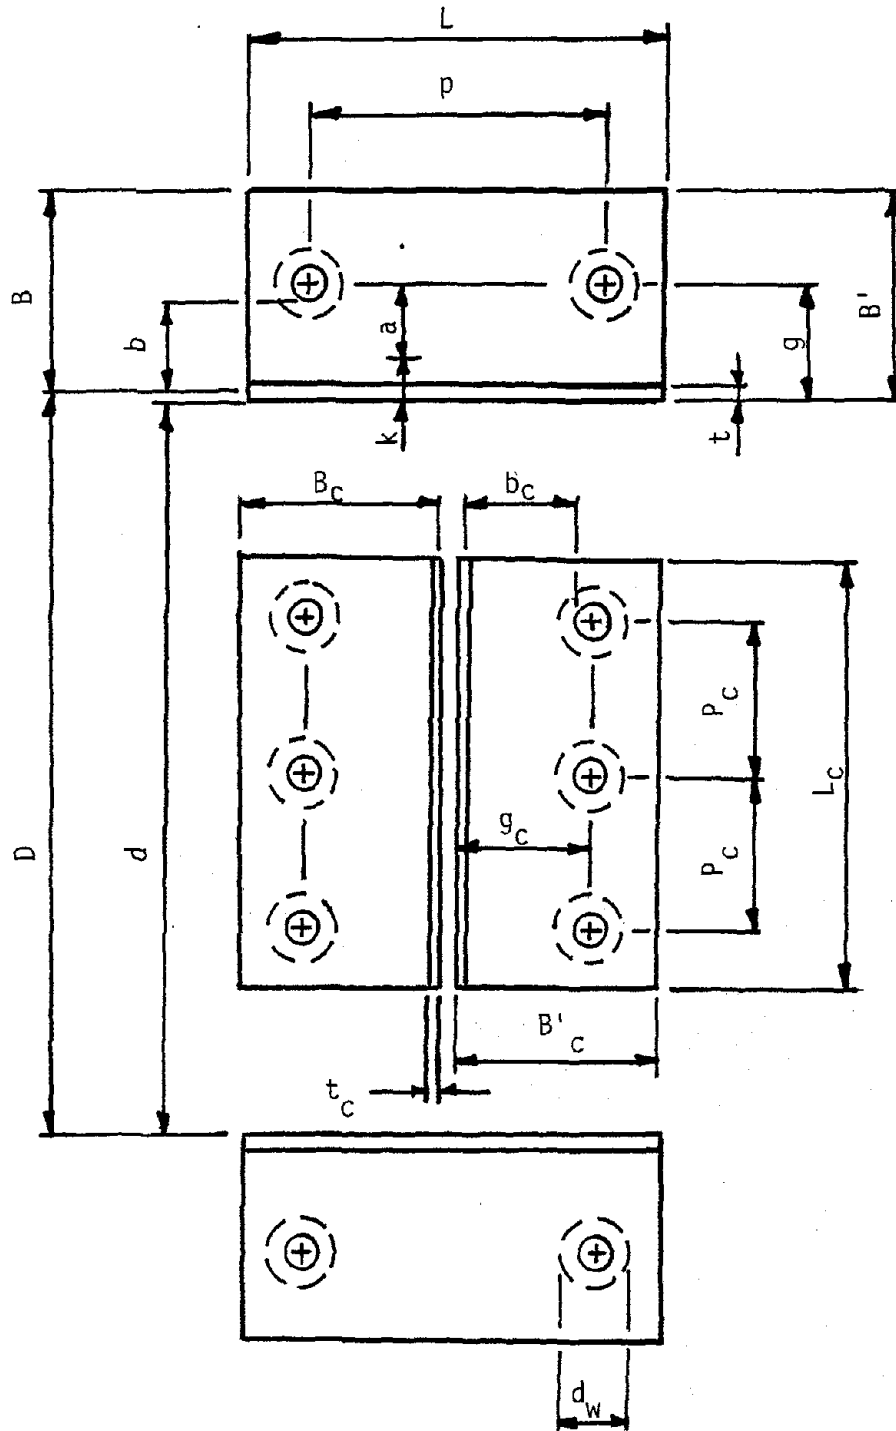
NOMENCLATURE FOR CONNECTION ELEMENTS
